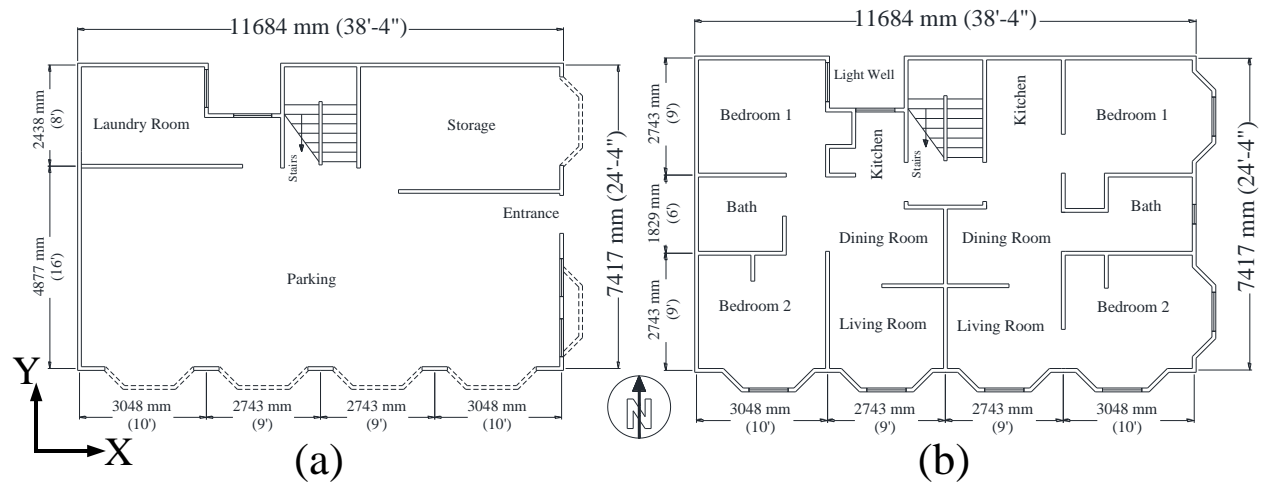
Floor plans of the four-story wood-frame building: (a) first story, and (b) upper stories.
